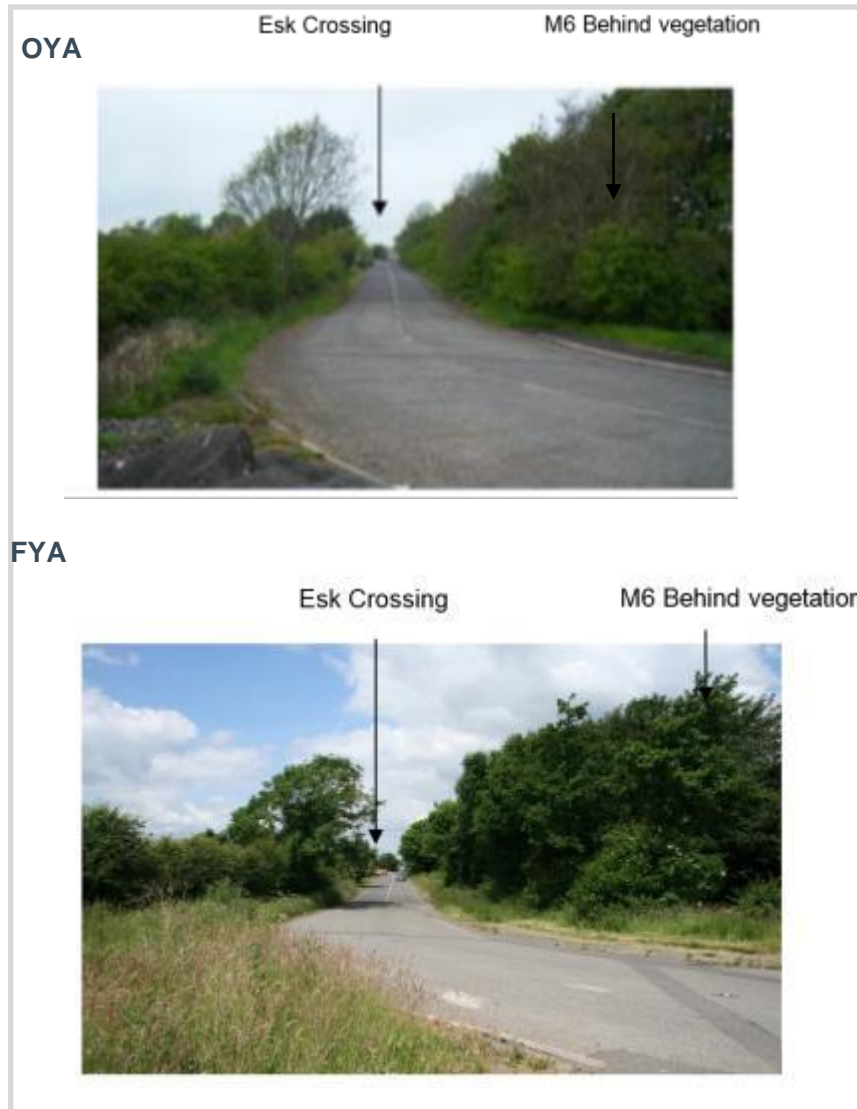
OYA and FYA view from Floriston Bridge looking north-west
